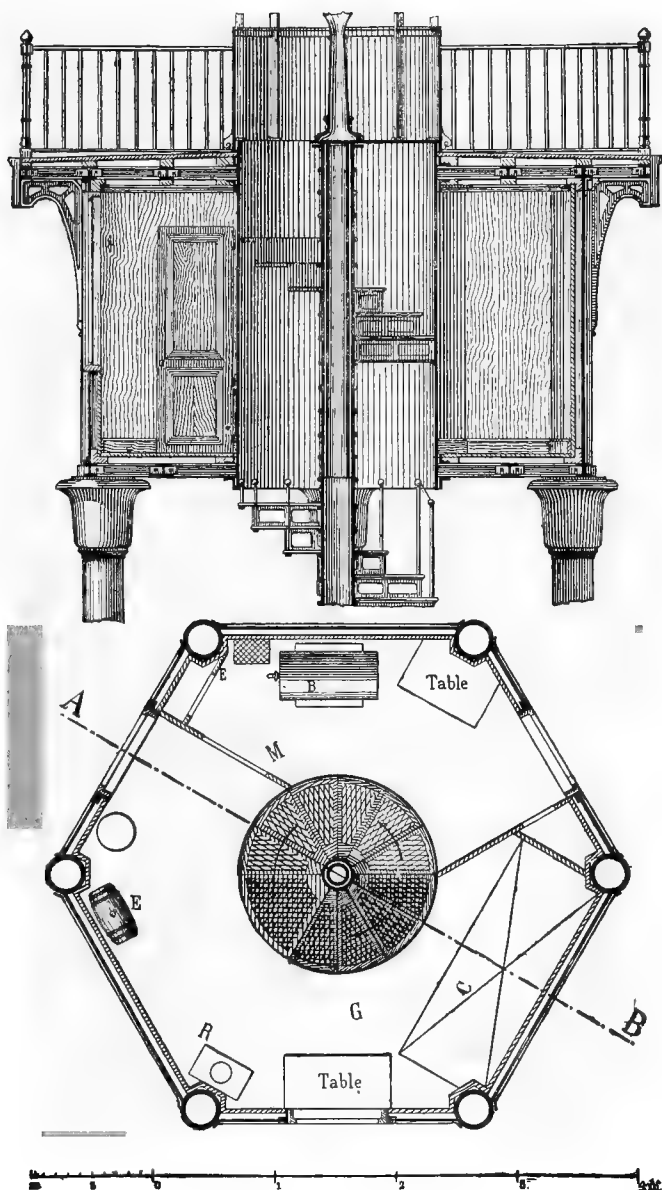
Section and plan of the lodging room of Port Vendres Light-house.
